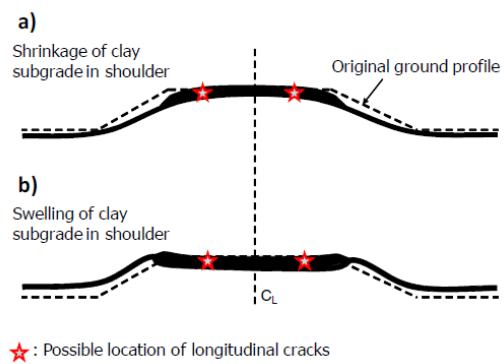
Longitudinal Crack Formation (Zornberg and Gupta 2009)
